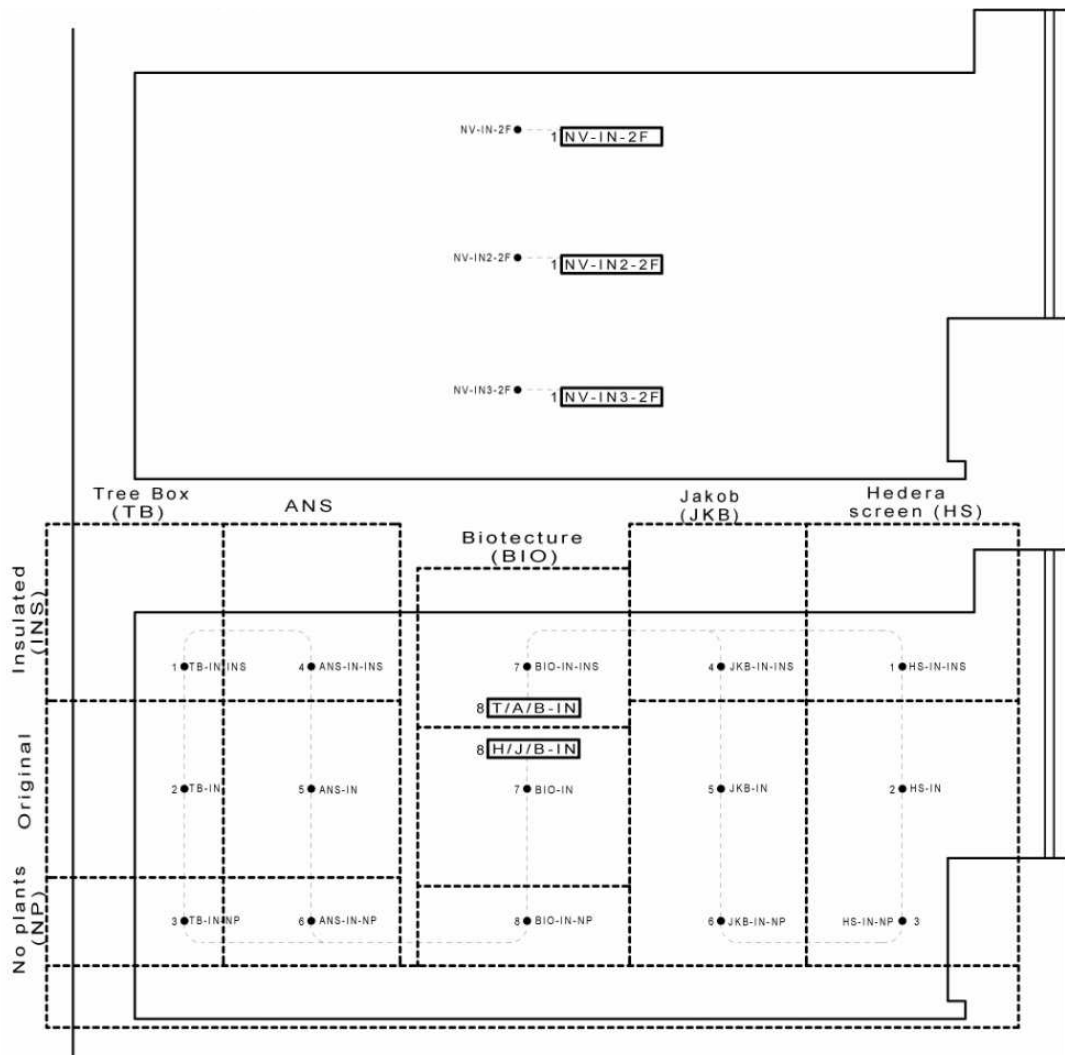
Elevation plan of the monitored section of the wall, showing locations of thermocouples measuring internal wall surface temperatures
